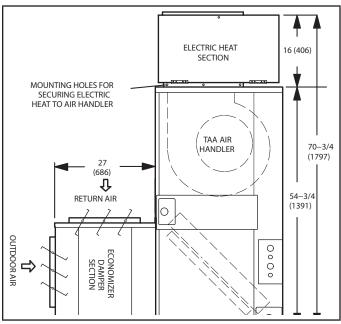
TAA Upflow Application – Dimensions – inches (mm)
